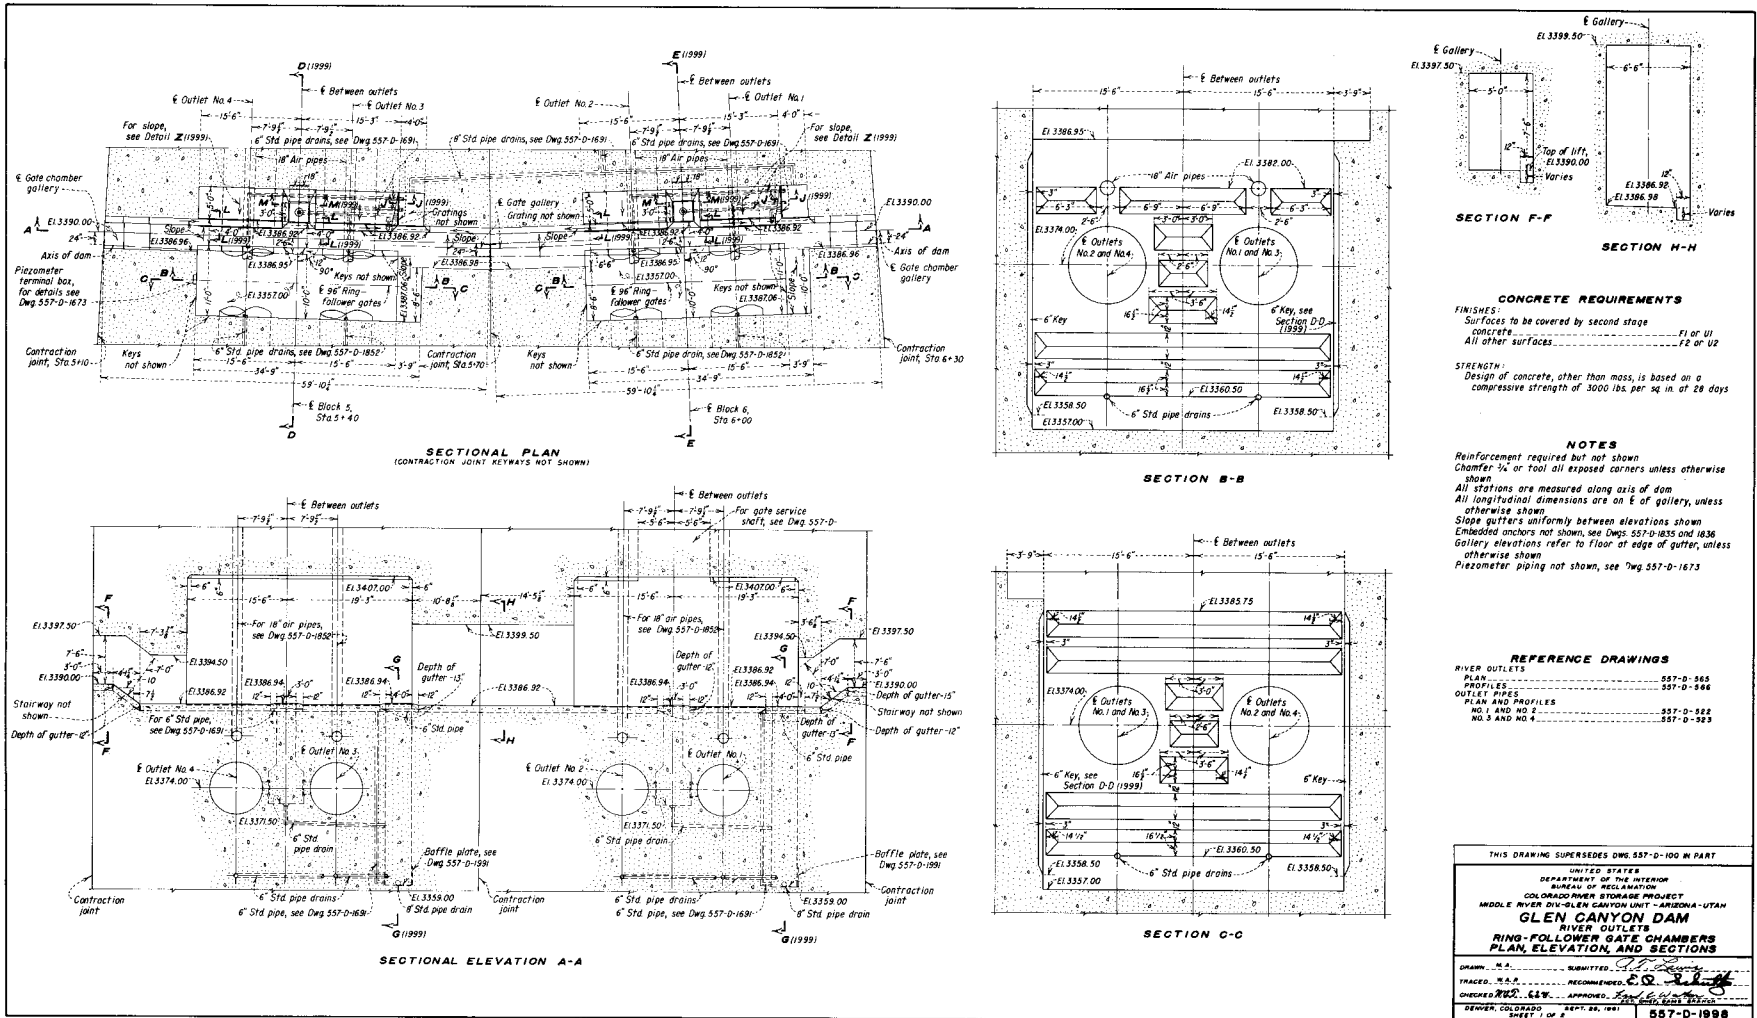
River outlets, ring-follower gate chambers—Plan, elevation, and sections. (Sheet 1 of 2.)
